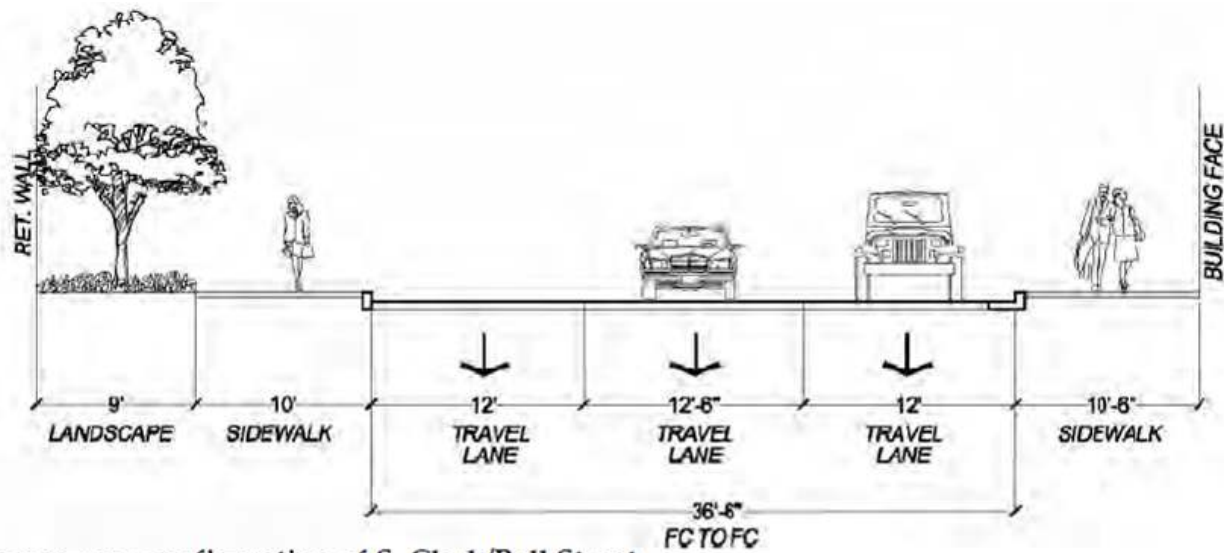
Existing one-way configuration of S. Clark/Bell Street
